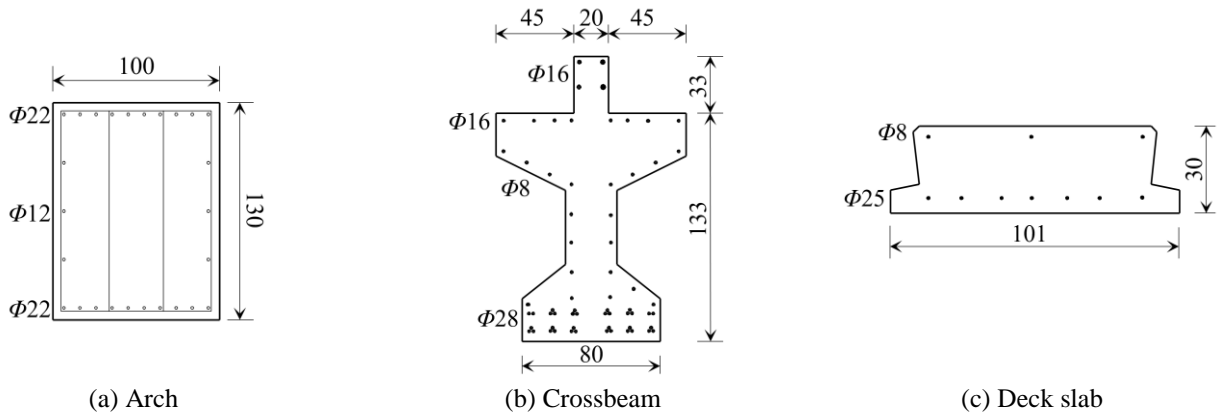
Section configurations of members (Unit: dimension in cm and rebar diameter in mm)
